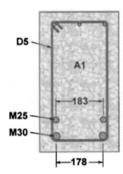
Cross-section of beam A1 (from Vecchio and Shim (2004))
